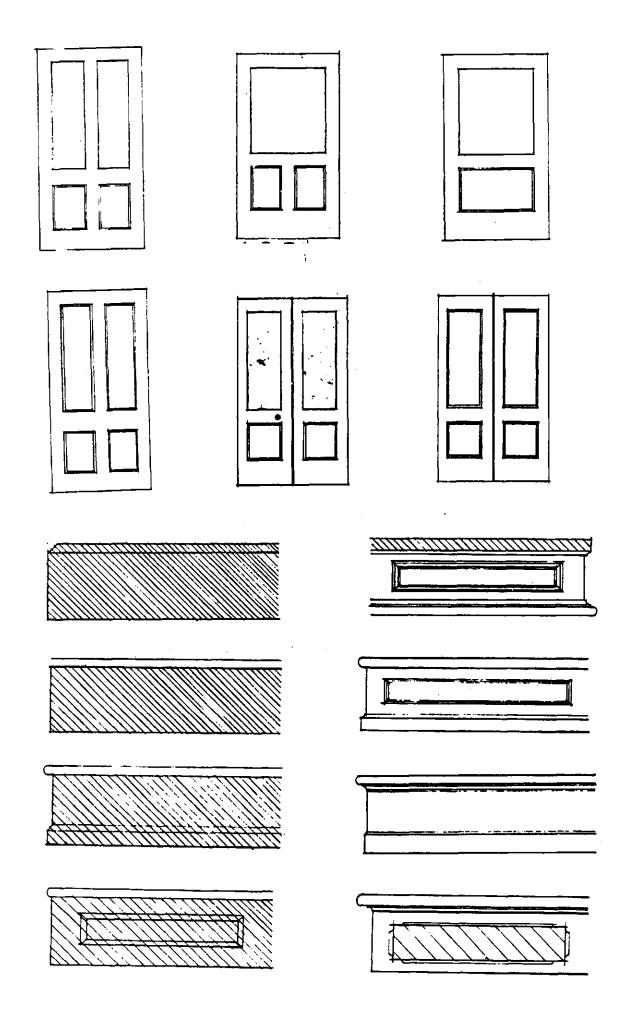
Some typical Stall Board and Door Details for Victorian Shops.
